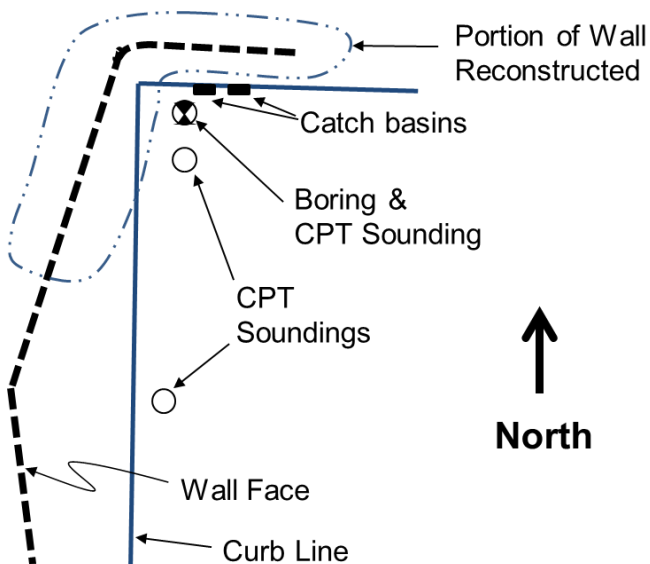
Approximate soil boring and CPT sounding locations relative to MSE wall plan layout (scale varies).
